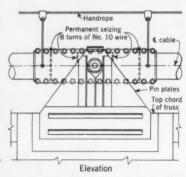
Cable band was used at midspan to transfer 1.290 kips of longitudinal wind load from the truss to the cable.
